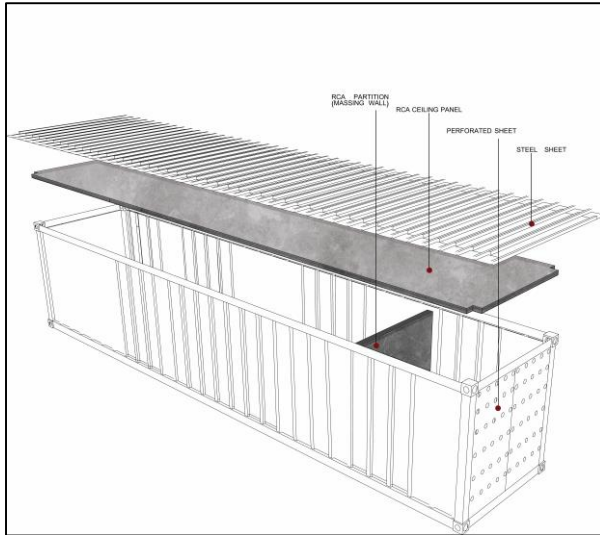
Renovation 1 model: adding RCA partition and RCA ceiling layer
